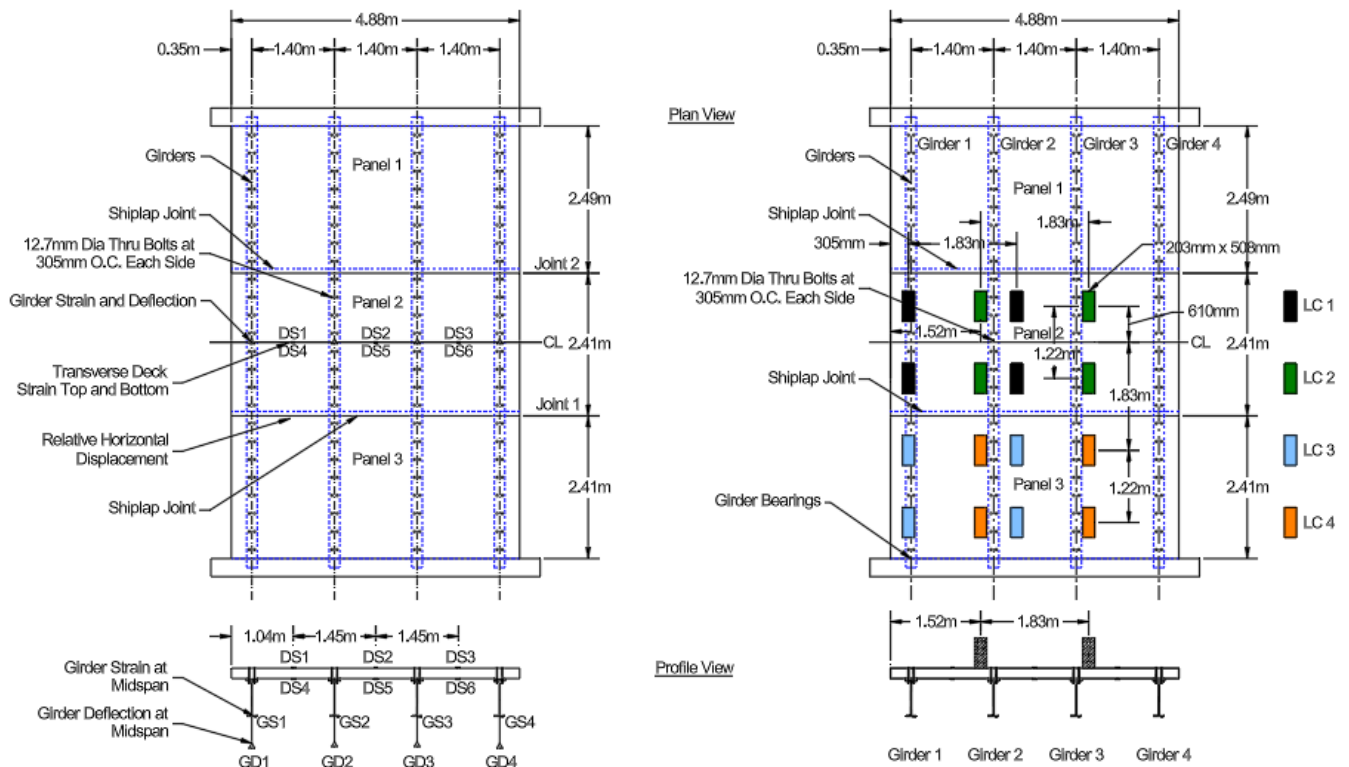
Four Girder Transverse Panel Configuration, Instrumentation, and Load Case Position
